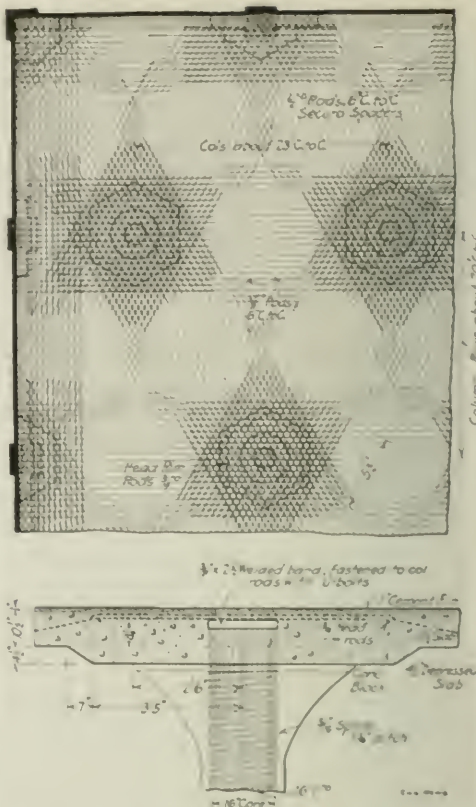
FLOOR USED IN SHOPS BUILDING AT HARVARD AVE., SHOPS OF CLEVELAND RY. CO. (New floor invented by David Morrow)
